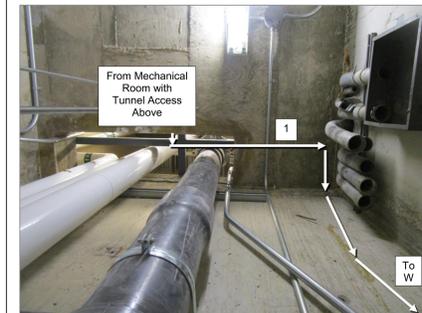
Location V, conduit entering tunnels from Works Building (view from below)
